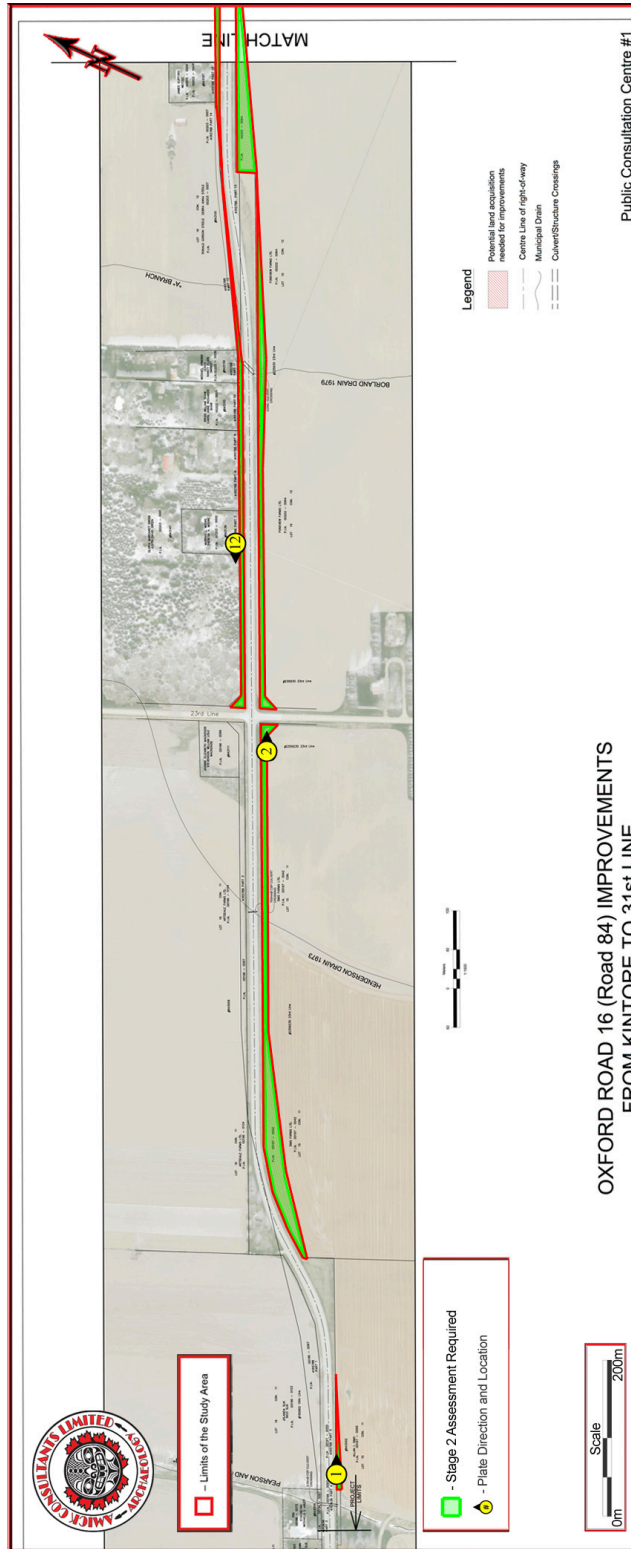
A DETAILED PLAN OF COUNTY ROAD 16
